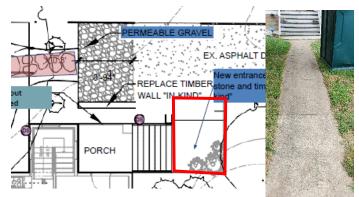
Site plan showing the proposed stone landing and stair (outlined in red), left. View of the concrete walkway to be demolished, right.
